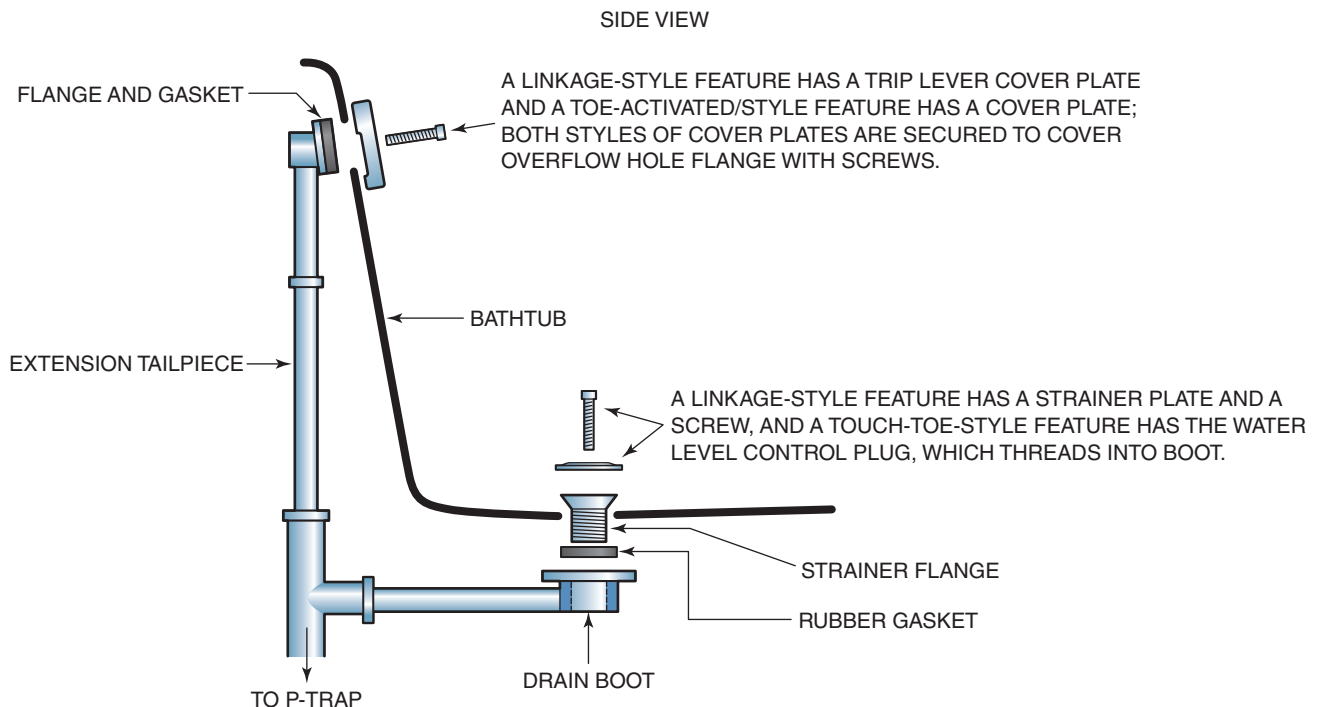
A bath waste and overflow assembly is connected to the overflow outlet and drain outlet of a tub.
